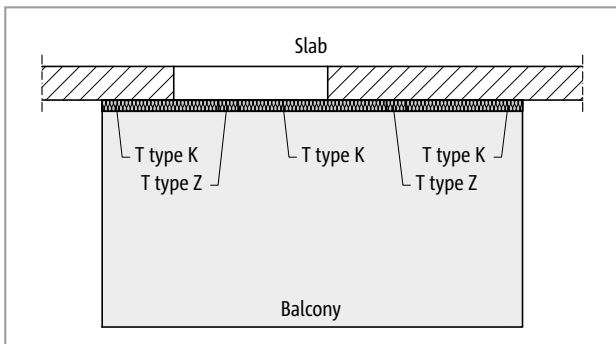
Schöck Isokorb® T type Z, K: Cantilevered balcony
